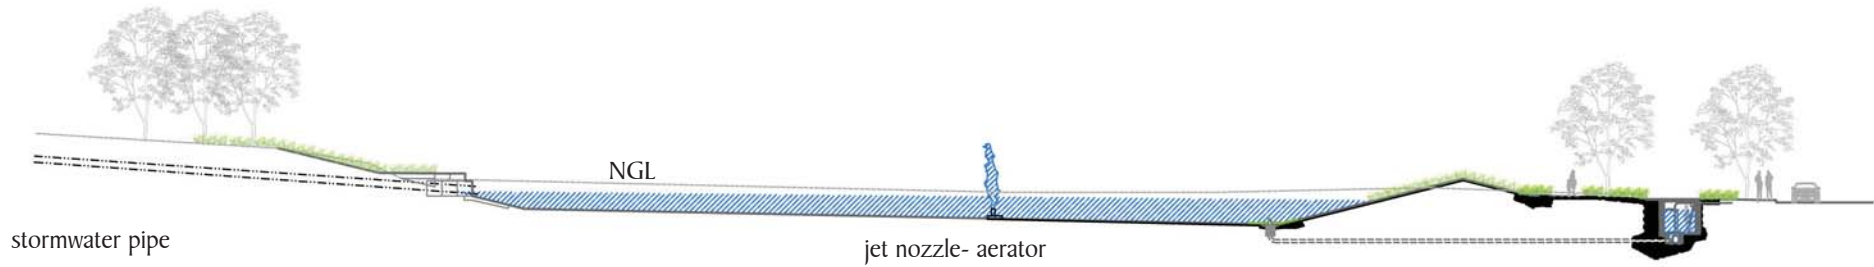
Typical north-south section through Dam I during summer. Scale 1:500 (Author, 2008)
